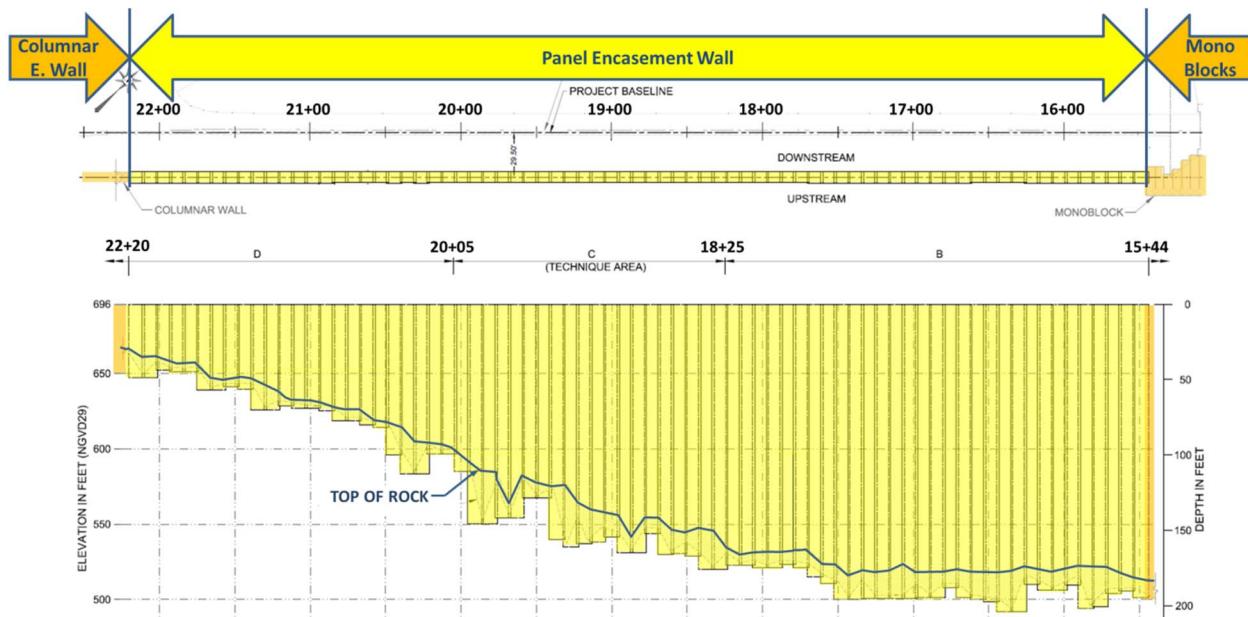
Panel encasement wall plan and profile (looking downstream, USACE 2011)
